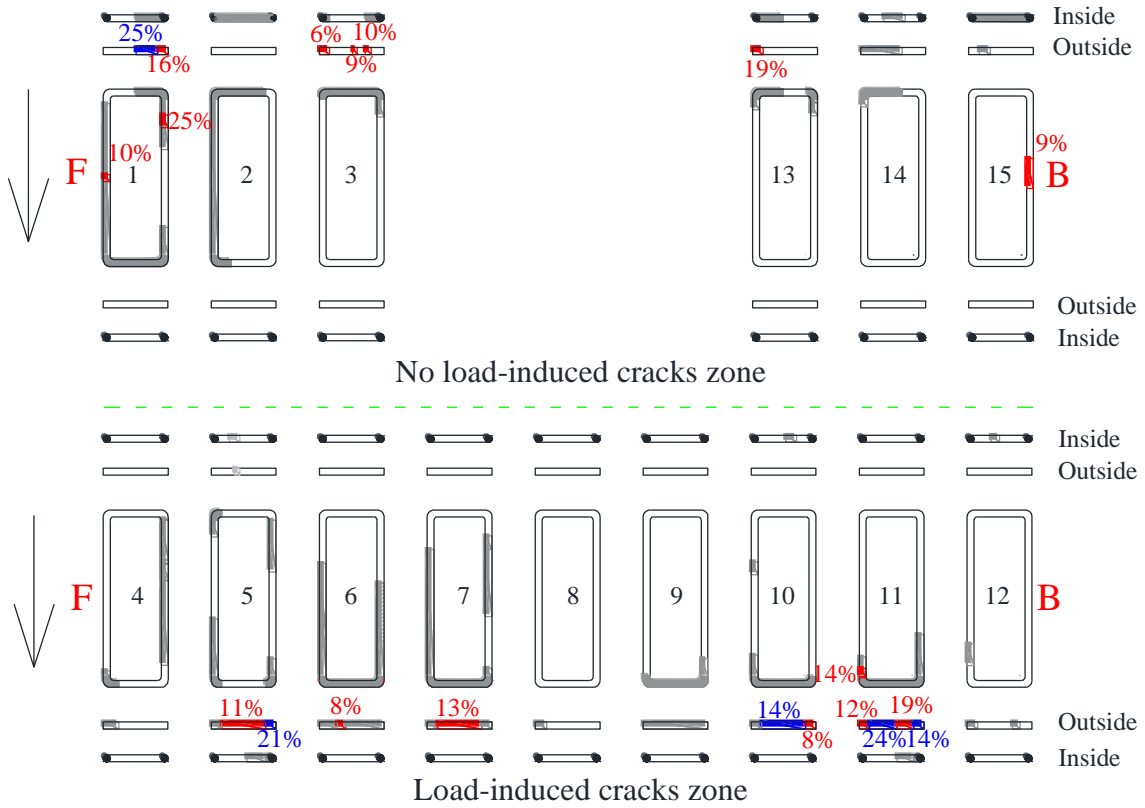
Corrosion situation of the stirrups of beam As02
